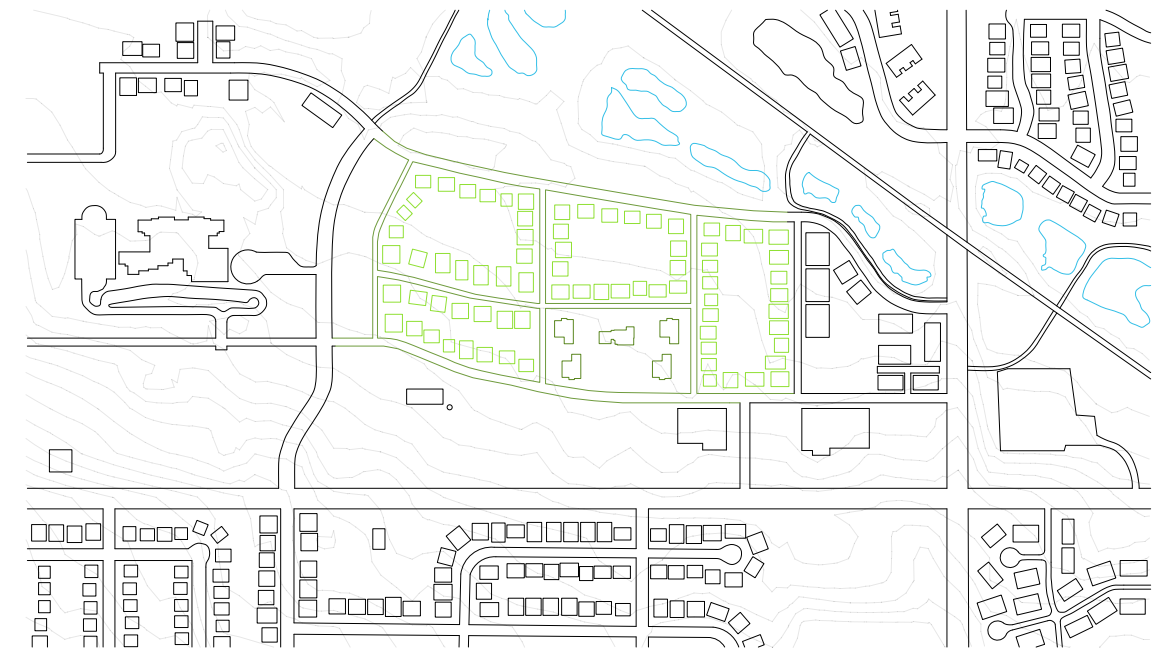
| Site map showing proposed site plan as well as potential future development around the site
